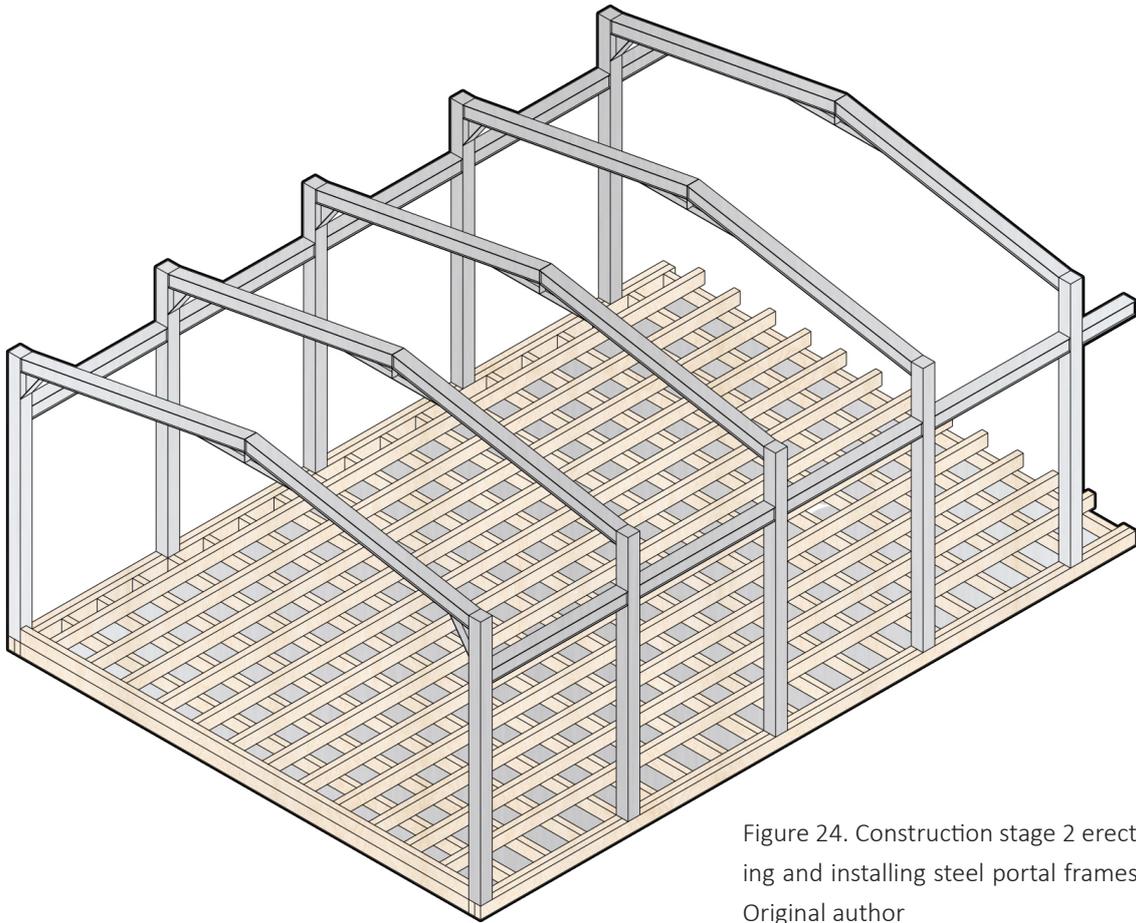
Construction stage 2 erecting and installing steel portal frames.
